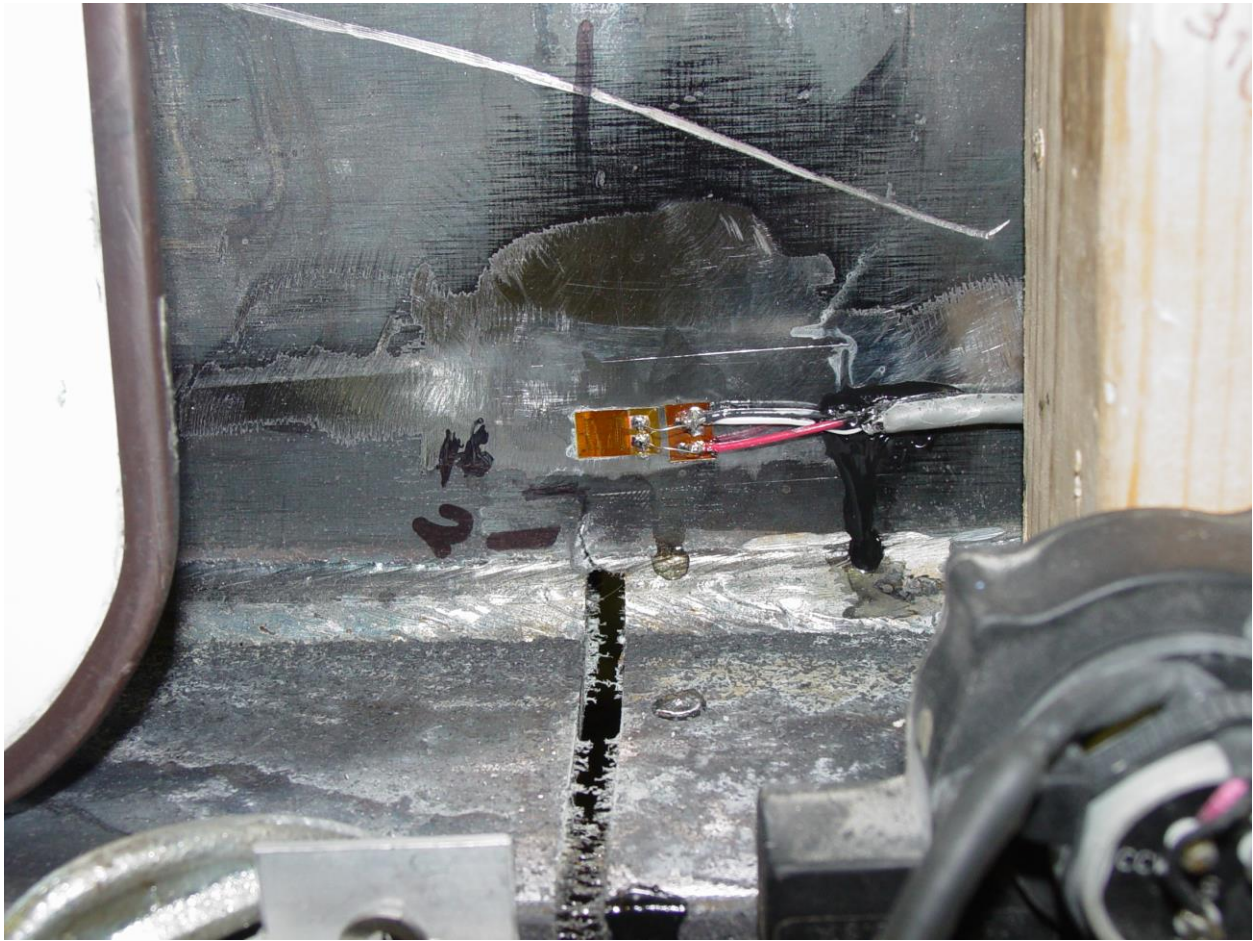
¼ inch Crack Propagation into the Girder Web
